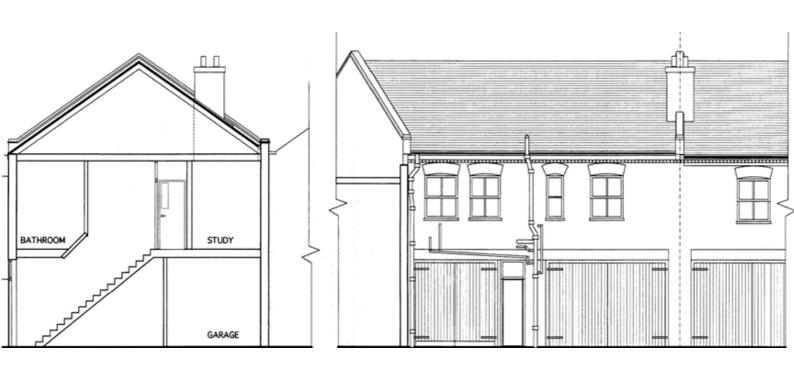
Elevation and section of Baynes Mews building. We would have expected the original mews buildings at the site to have looked very similar to this.
